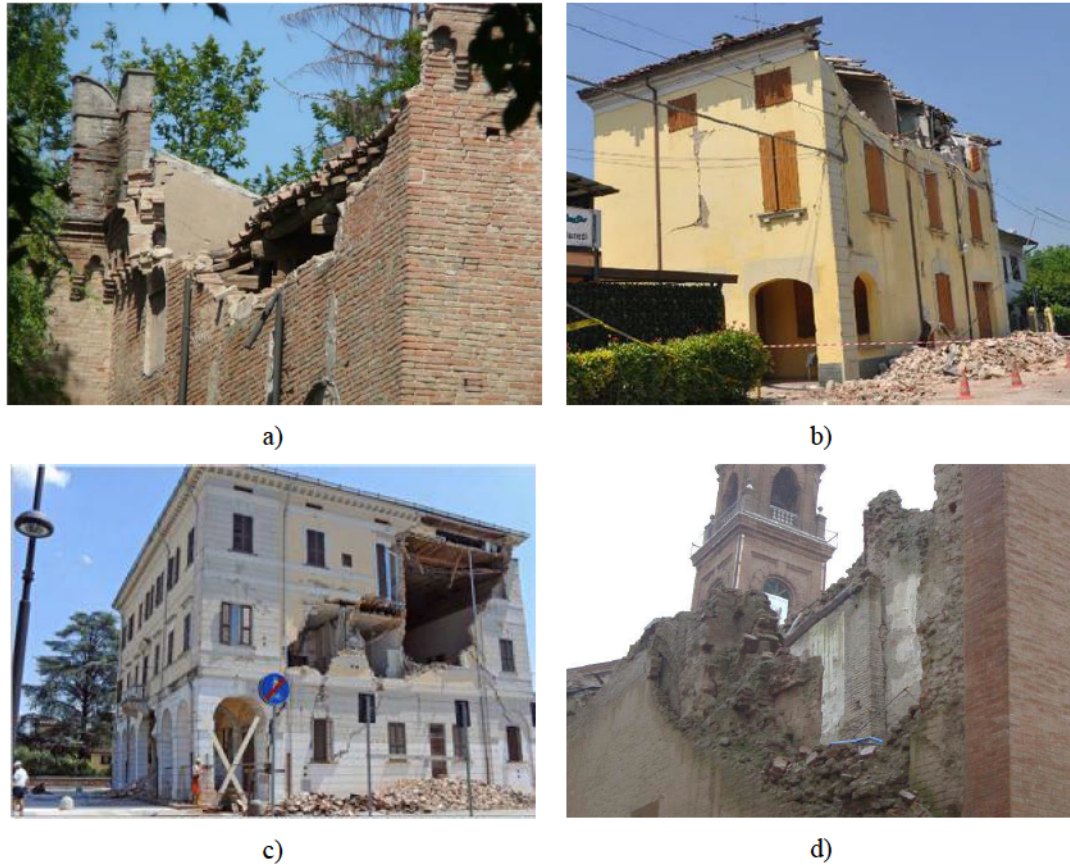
examples of damage to the walls of masonry buildings in the Emilia earthquake (images from Ferretti and Tralli (2013)).
